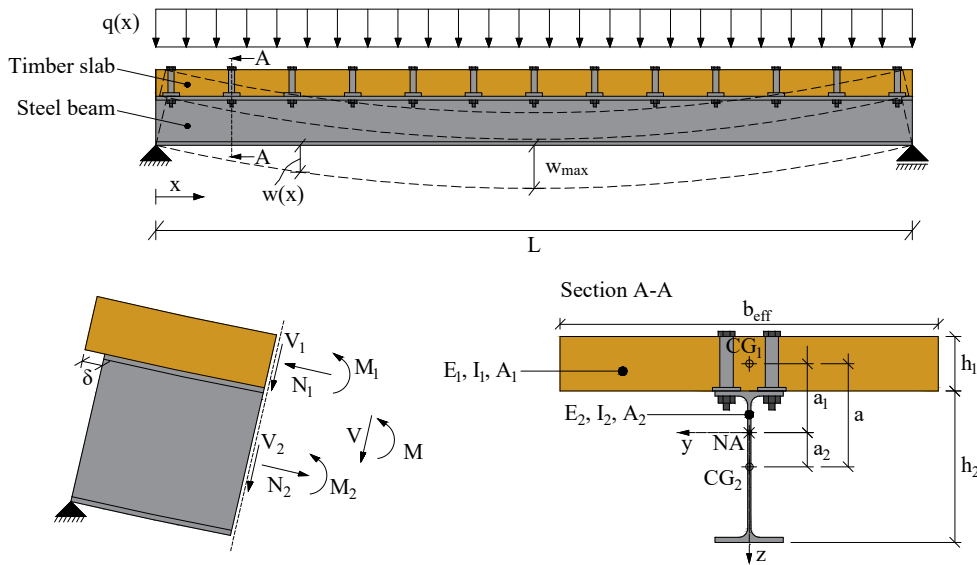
Idealisation of the steel-timber composite beam system and cross-section geometry definitions.
